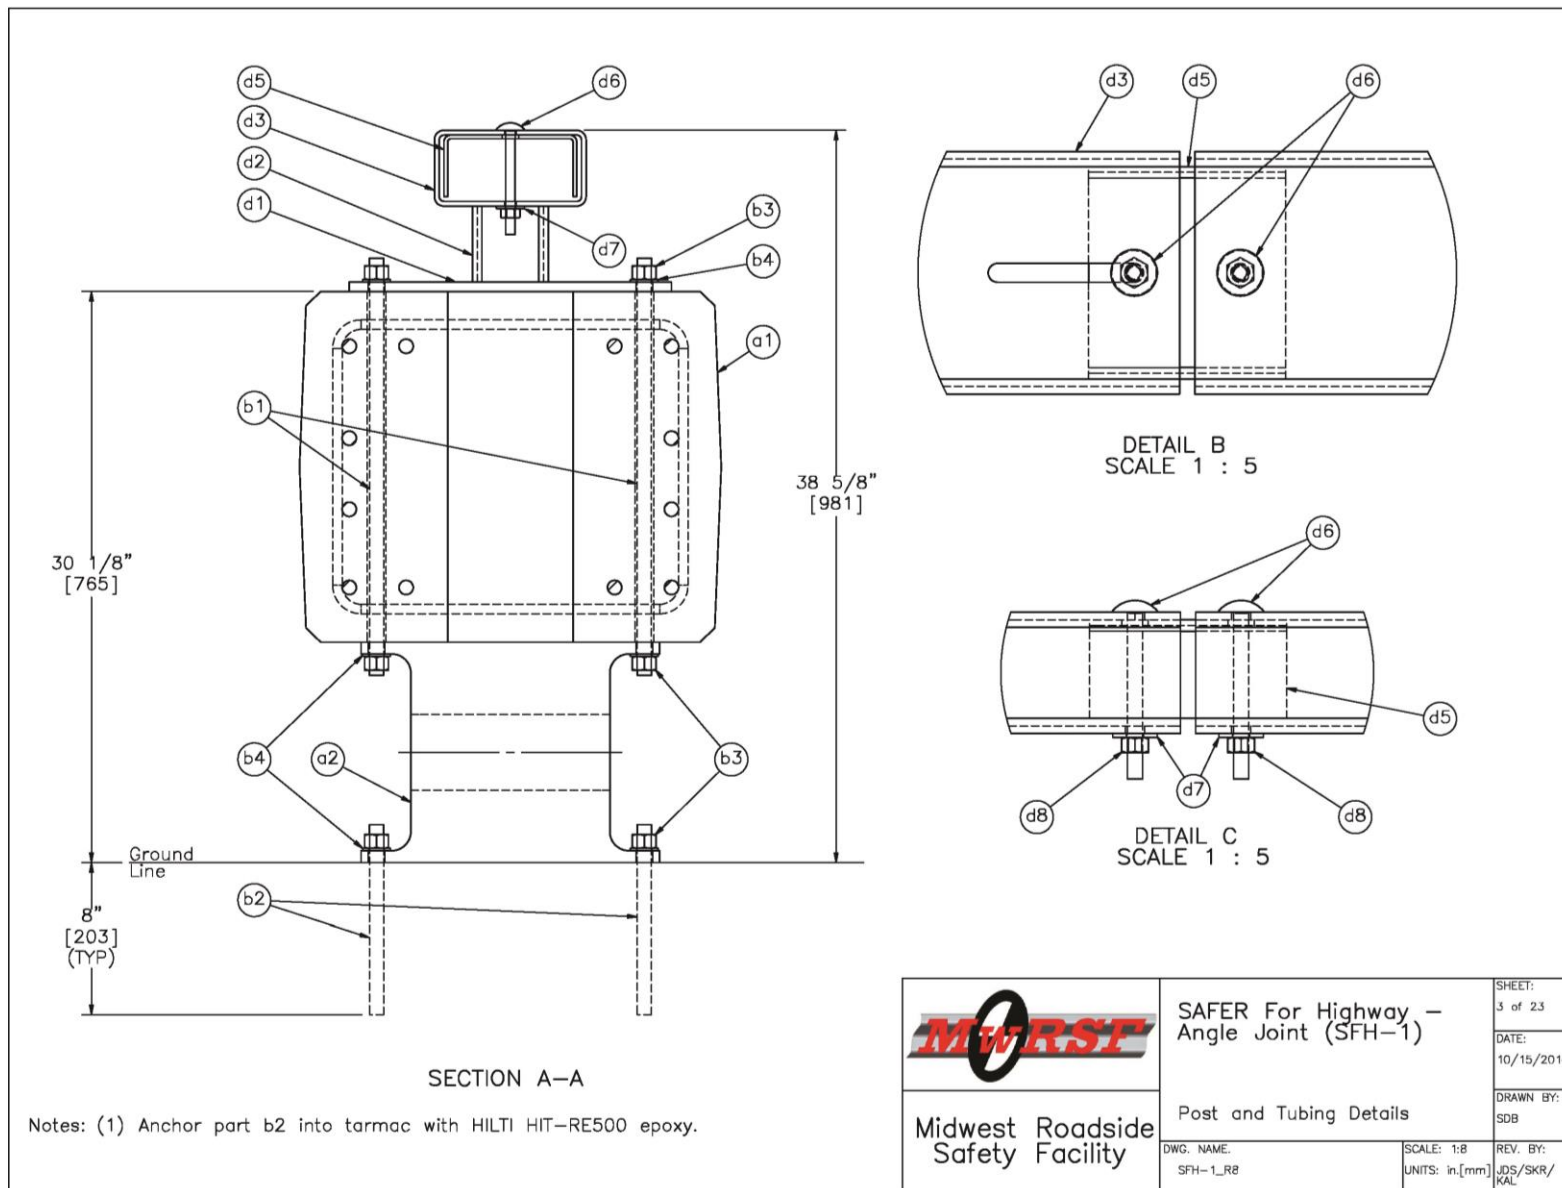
Recommended Barrier Design for Full-Scale Crash Testing, Post and Tubing Details
